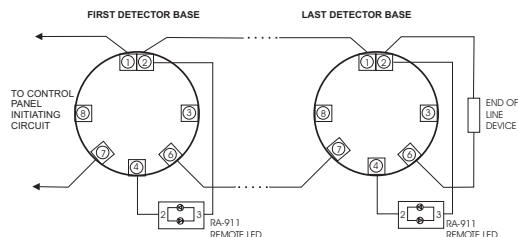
2WRLT/2WRLTC Wiring with Remote Indicator
